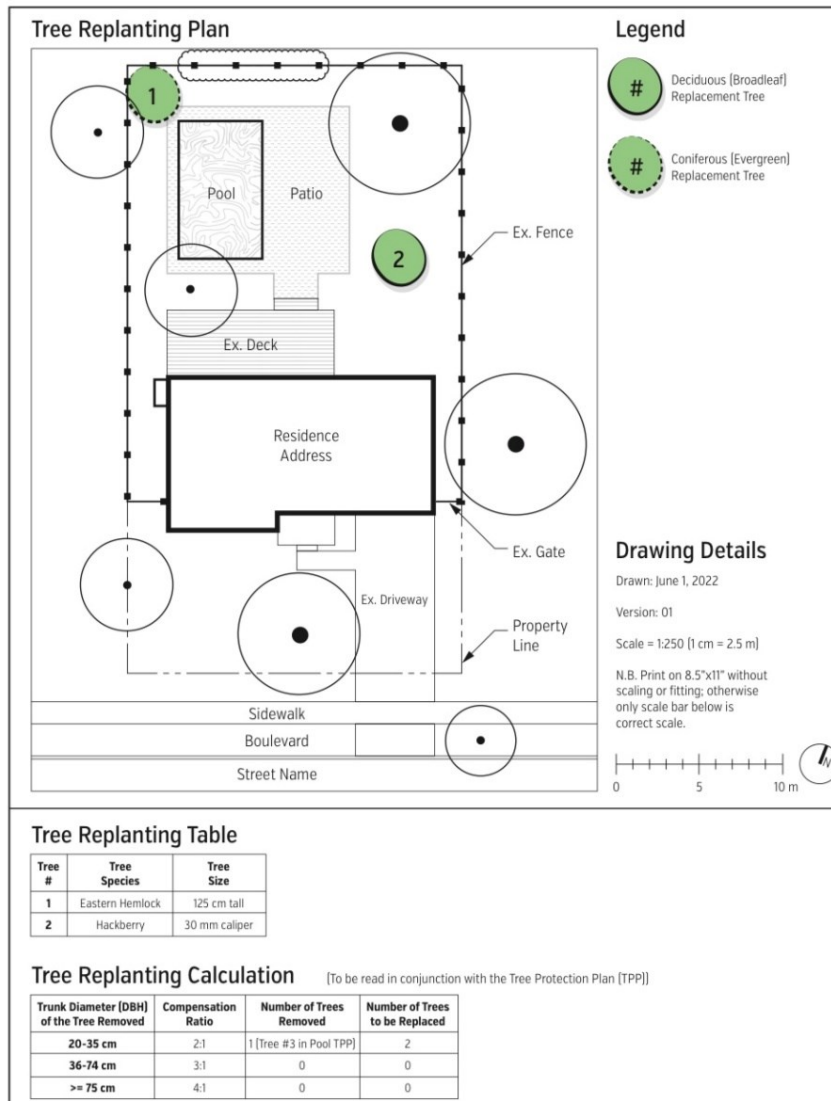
Example of a Tree Replanting Plan (photo by Scott Mooney)
